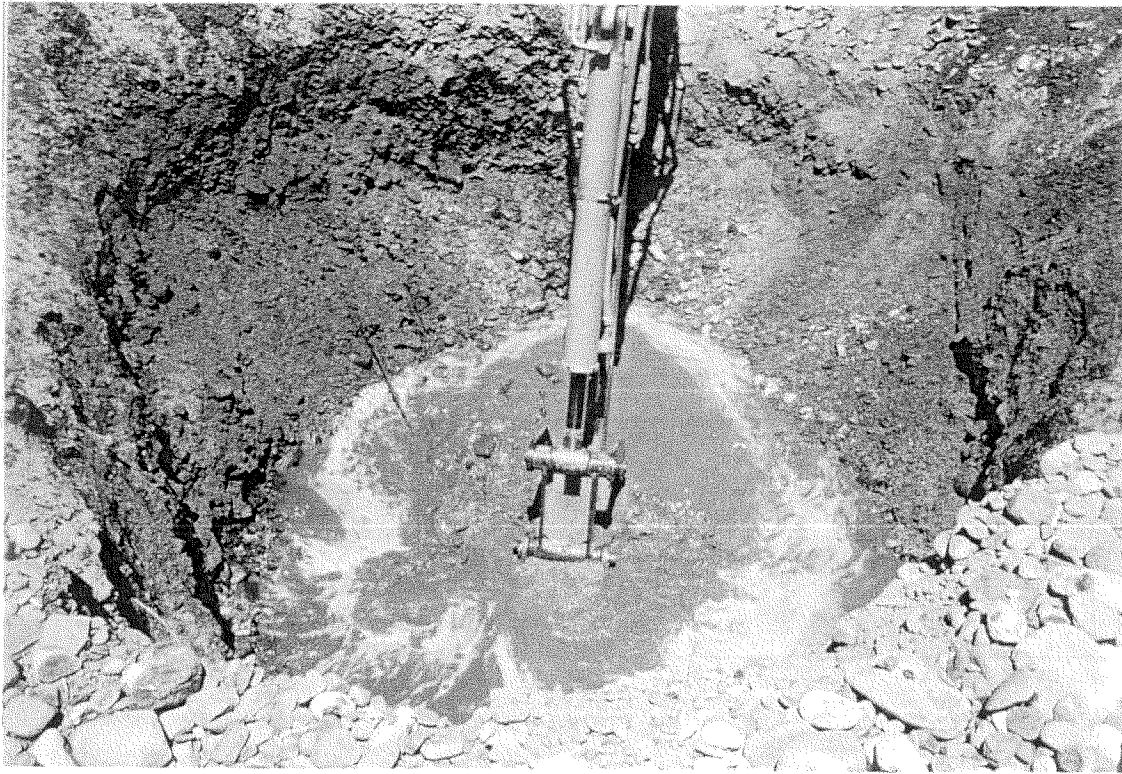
Excavation of Test Pit 3. Note poorly graded gravel with sand and cobbles along pit walls.
